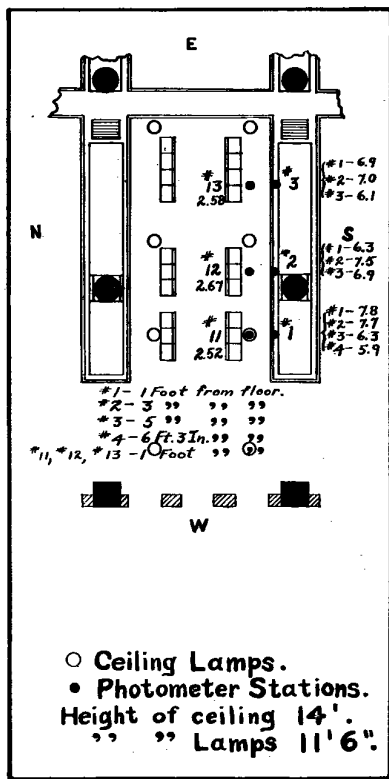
Section plan of second floor, (shoe department), showing location of furniture, pillars, lighting units, test stations and illumination data.
